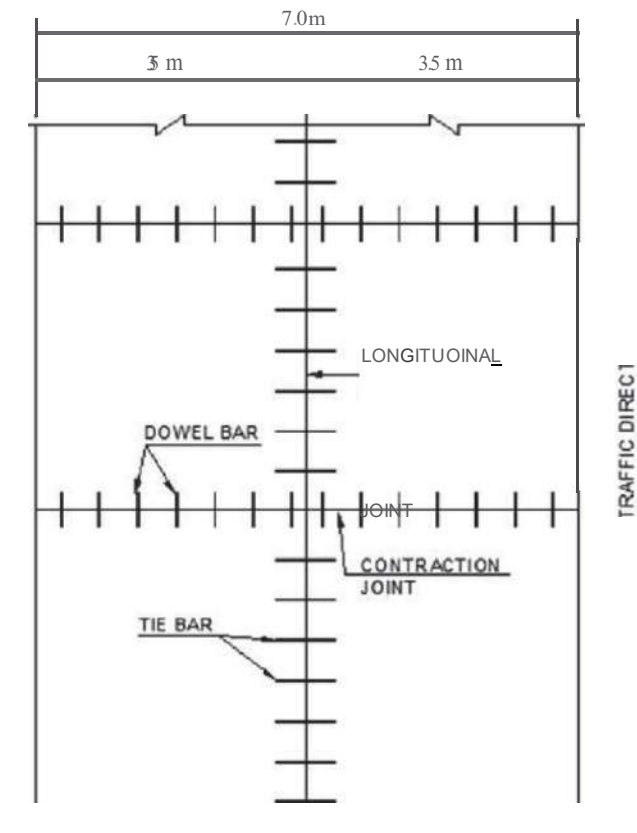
Joints Configuration of Two Lane Road without Tied Shoulder
